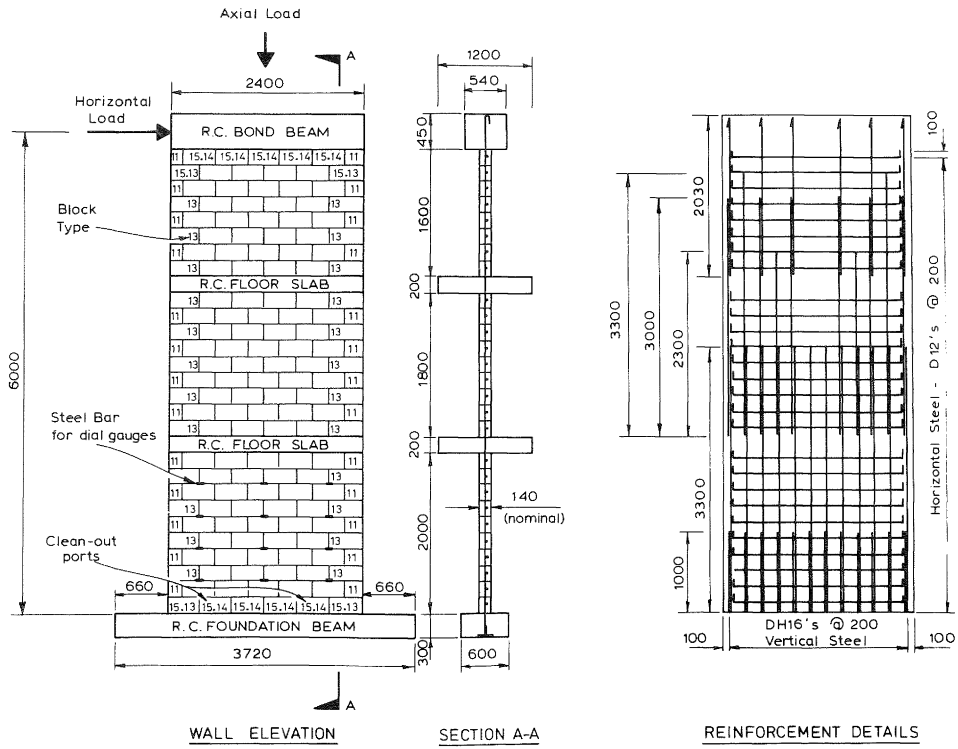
WALL DIMENSIONS AND REINFORCING
